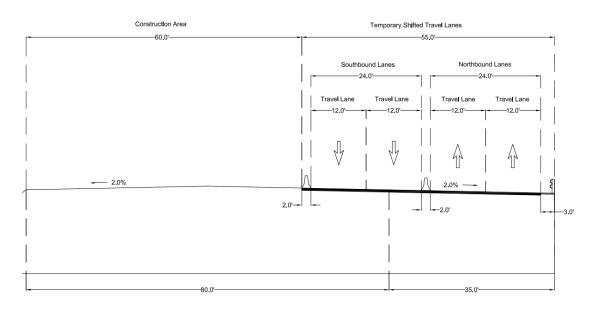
Typical phase two (2) cross section of proposed lane configuration on Highway 17.
